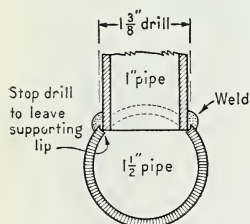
Welded joint where heating pipe joins header.
